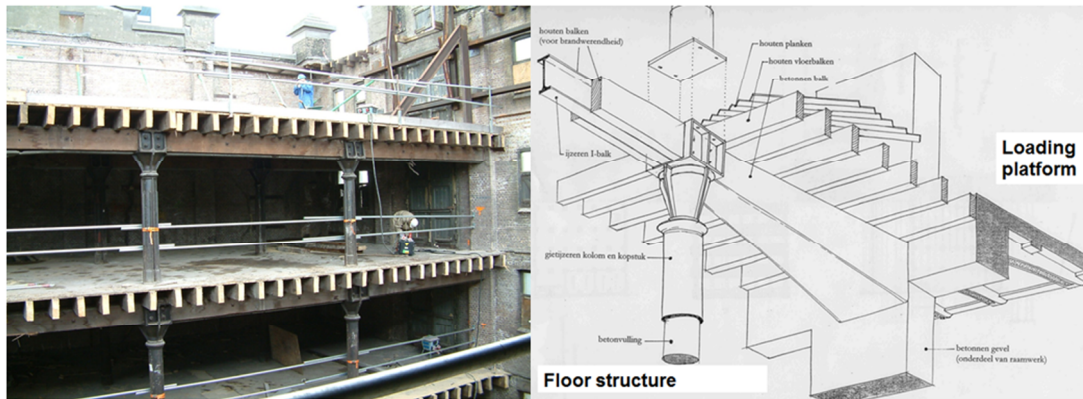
Jobsveem - (Left) Cross section of the building exposing the structure (Right) 3D sketch of the loading platforms (retrieved from the thesis of Martijn Velkamp)
